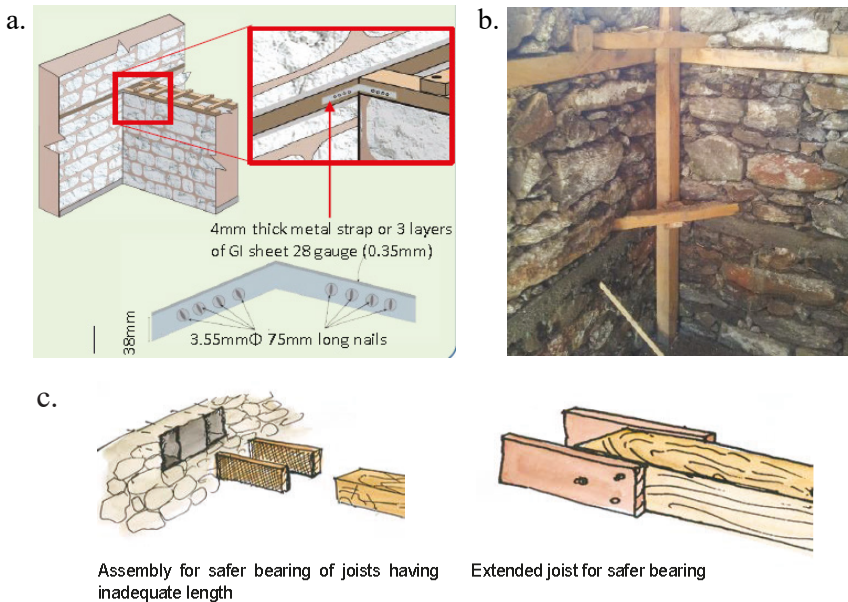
a. A method for connection of cross walls b. Installation of wooden vertical member c. roof and floor joist's extension detail²
